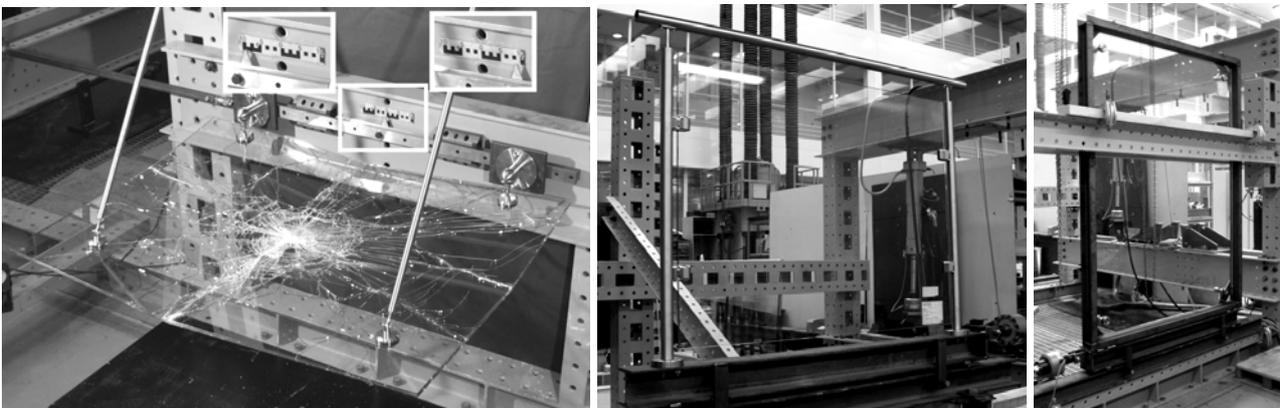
Test set-ups for earthquake test: canopy, railing and facade element
